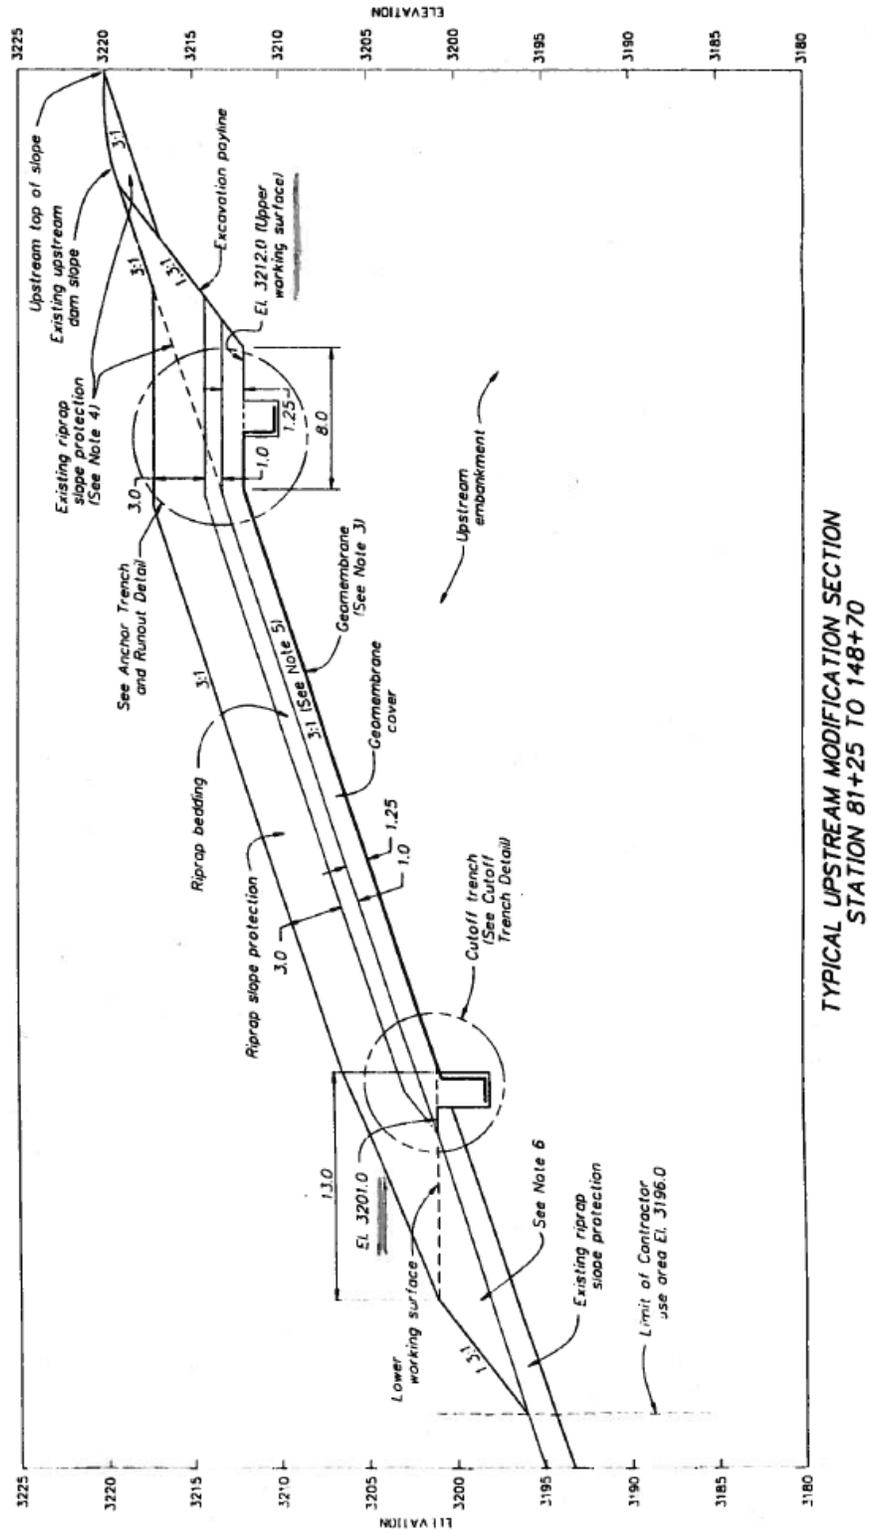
Pablo Dam geomembrane cutoff design.
